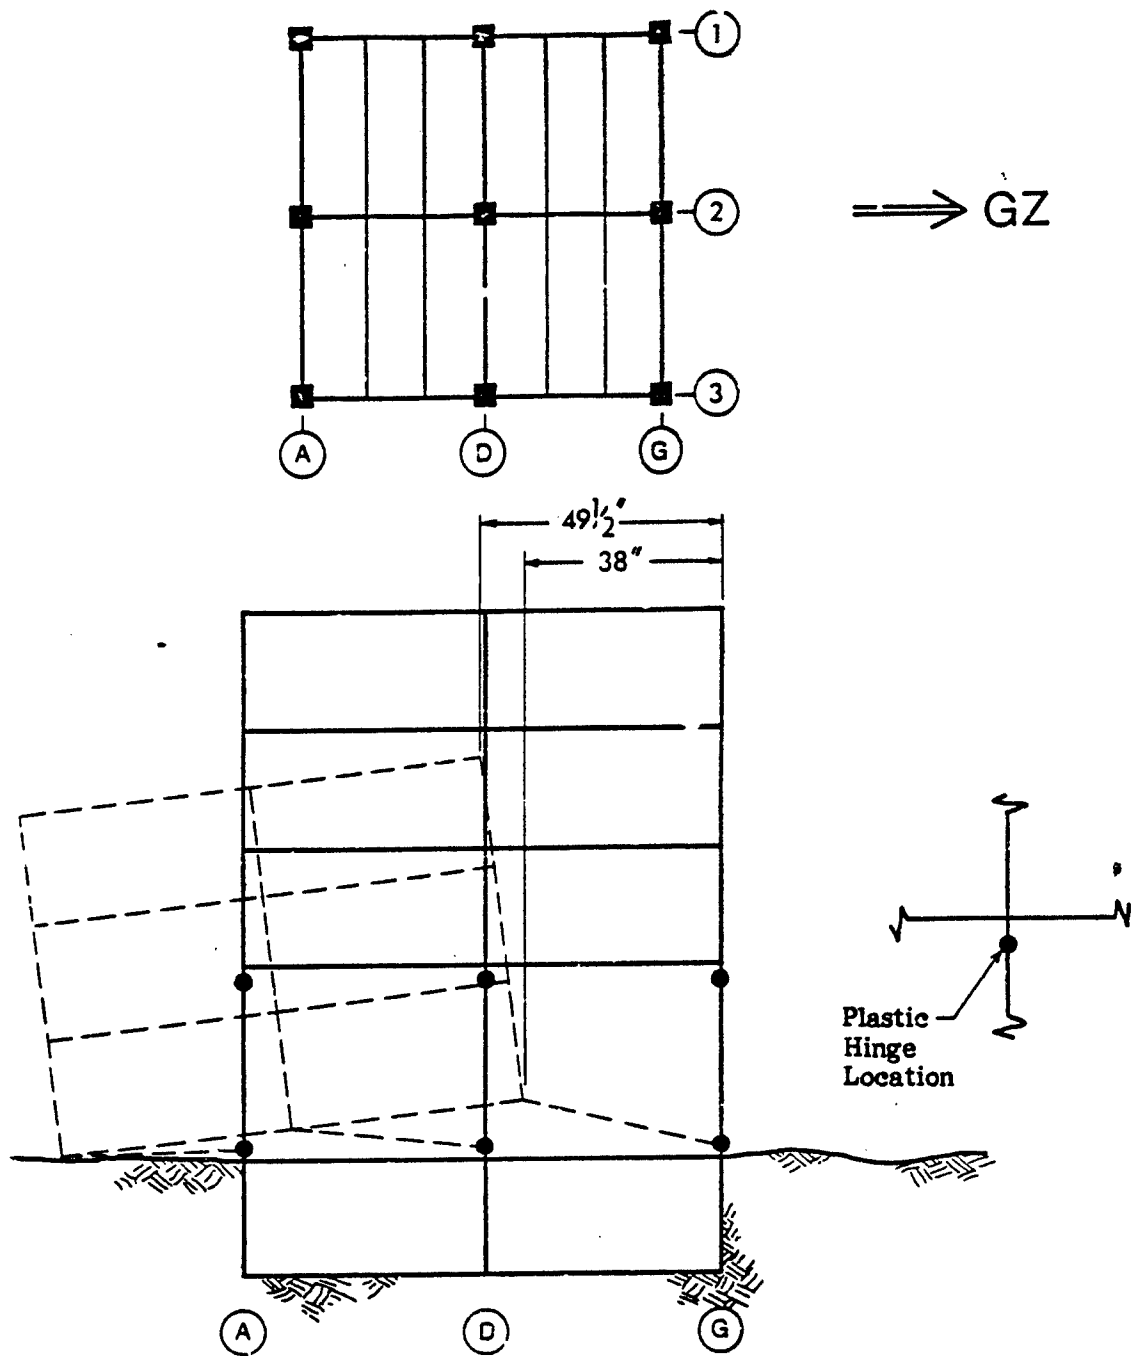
Final Deformed Position of Steel Frame Along Column Line ③.
